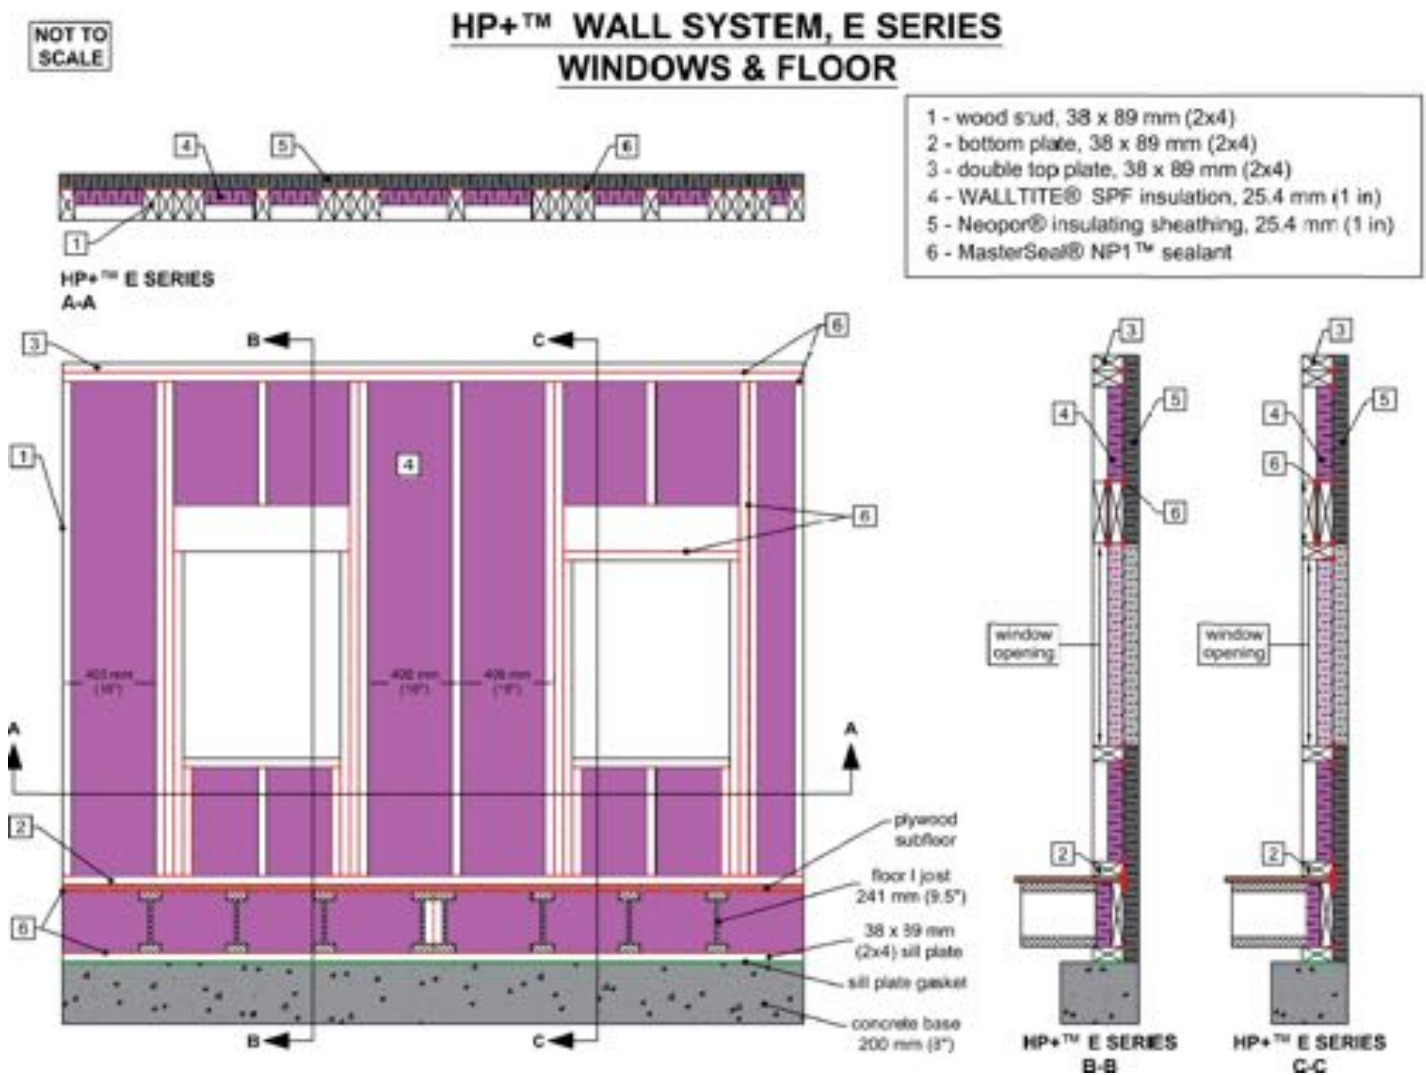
Tested wall specimen “HP+™ E Series” with windows, floor and concrete base
